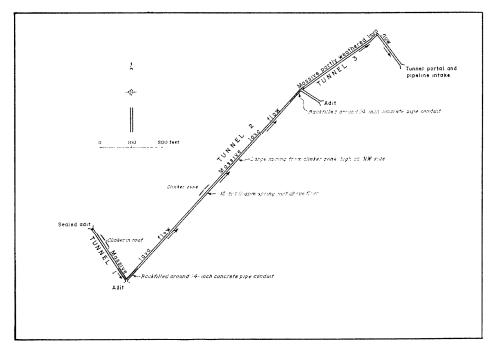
Plan of tunnel 9, Kauai County Enoka tunnel.
